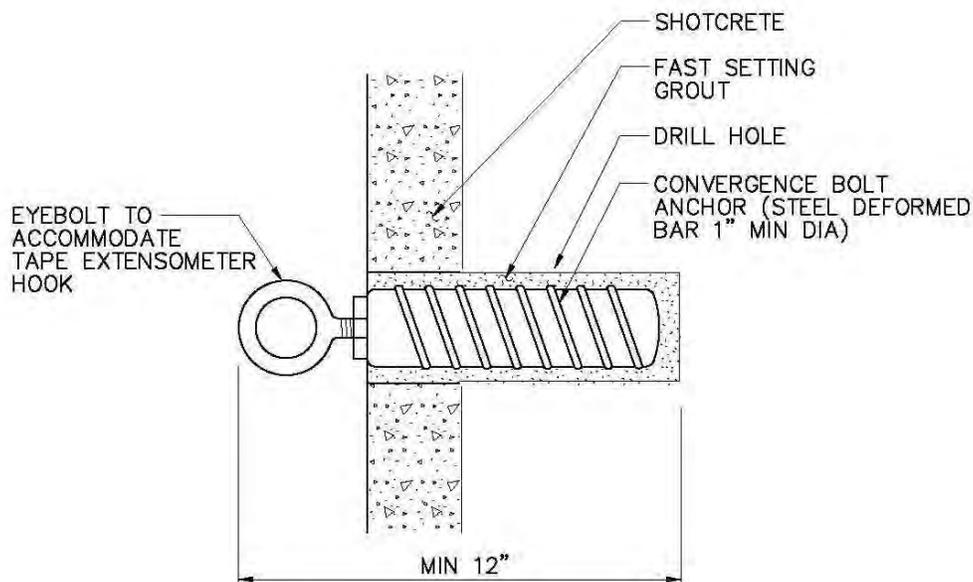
Typical Convergence Bolt Installation Arrangement
